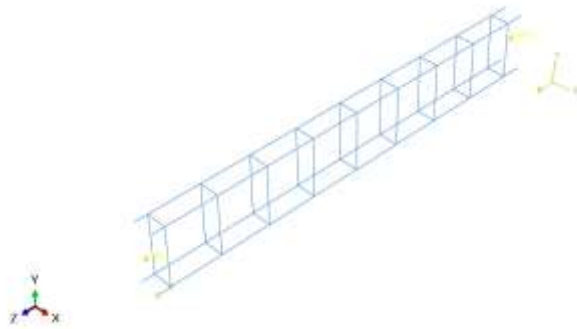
Meshing of longitudinal and transverse steel rebars
